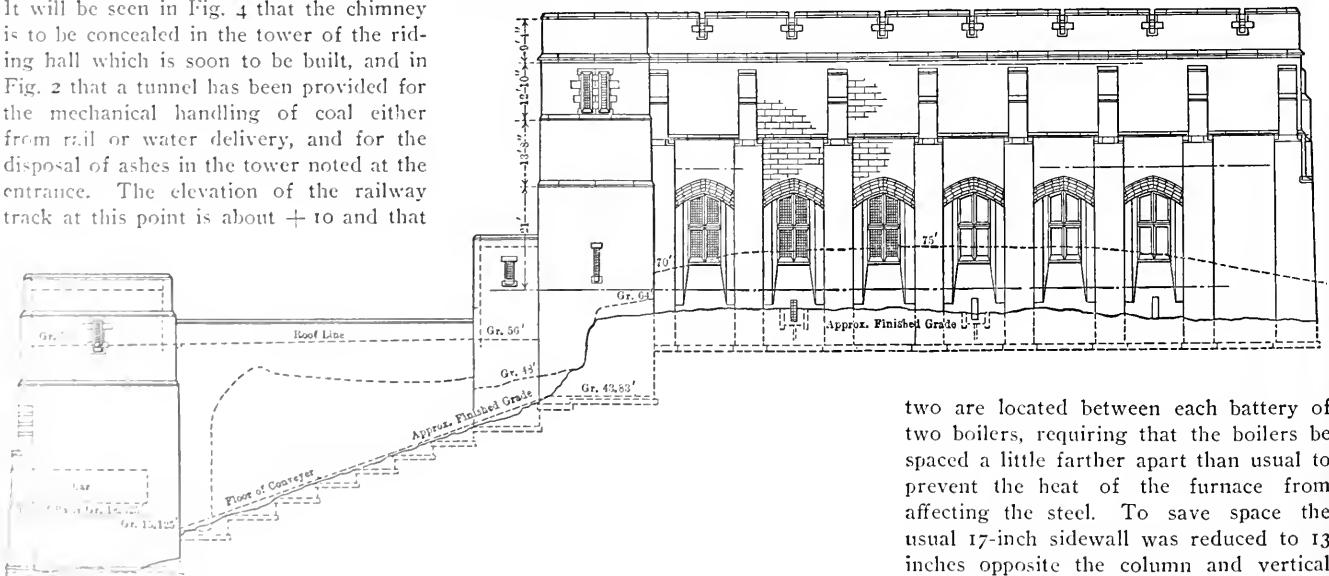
POWER PLANT ON RIVER SIDE, SHOWING ELEVATIONS OF COAL TUNNEL AND BUILDING
